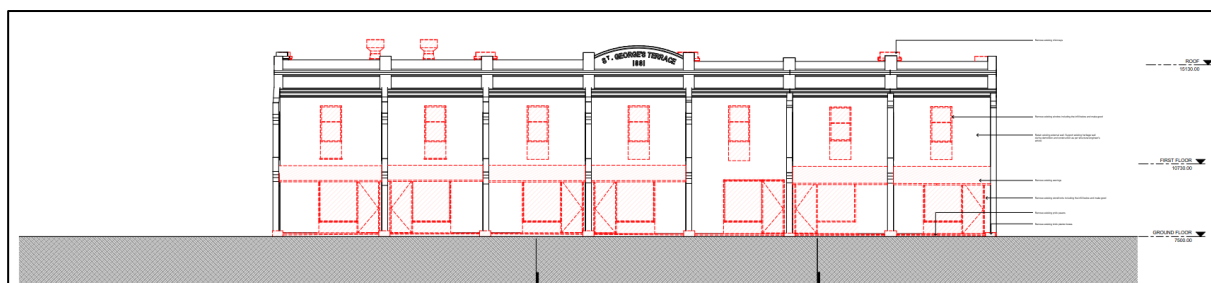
St George's Terrace south elevation demolition plan (Source: Genton, 2021).
